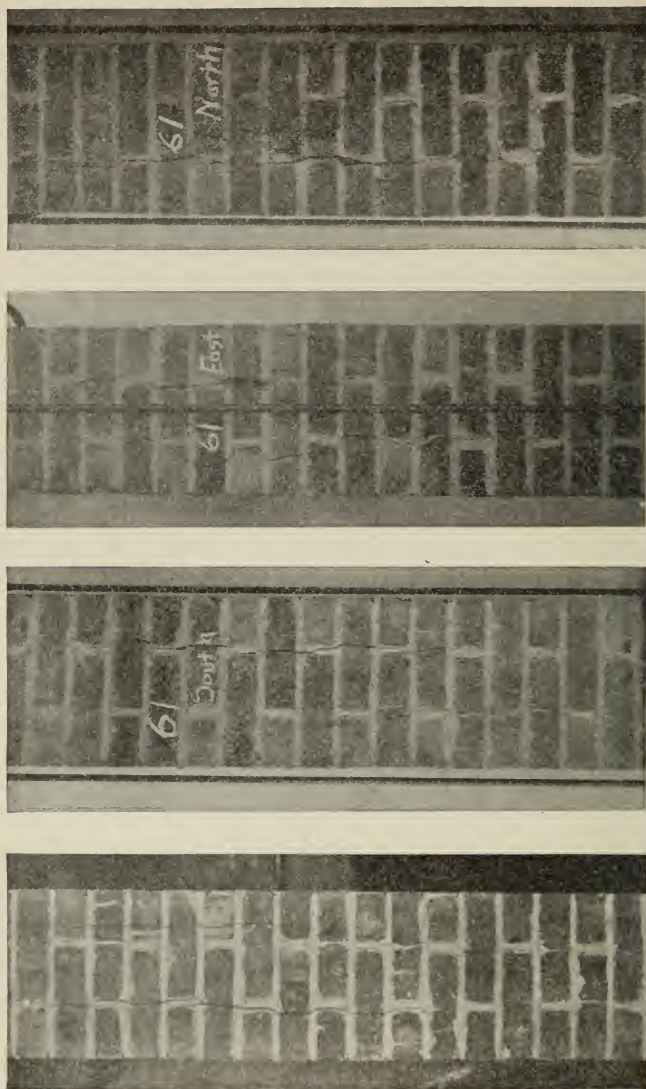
VIEWS OF BRICK COLUMN NO. 61 AFTER TEST SHOWING CRACKS FORMED ON EACH OF THE FOUR FACES.
